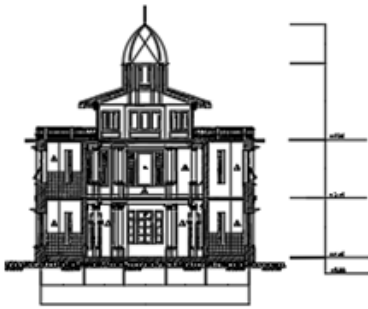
Piraya, R. Maen Sri Waterworks: Architectural drawings, main department building; layout, drawing/digital, 2023.
